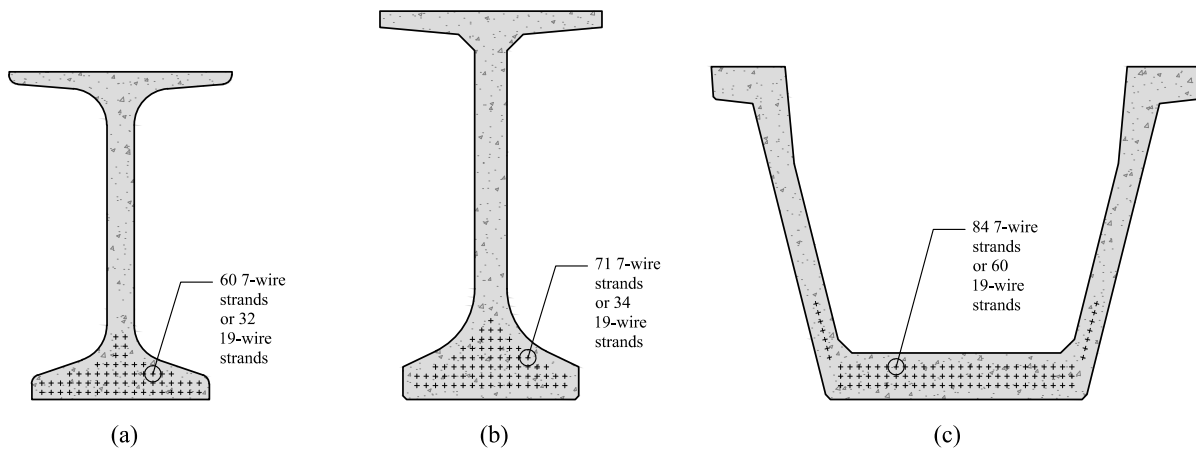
Types of girders used in the study: N.U. Girder (a), Florida I girder (b), and Florida U girder. The concrete cover from the bottom fiber to the first line of strands in N.U. Girders were 1.5-in. and 2.0-in., for the 7-wire and 19-wire strands, respectively, whereas 3 inches for the FIB girders, and 3-in. and 2-in. for the FUB girders*.
